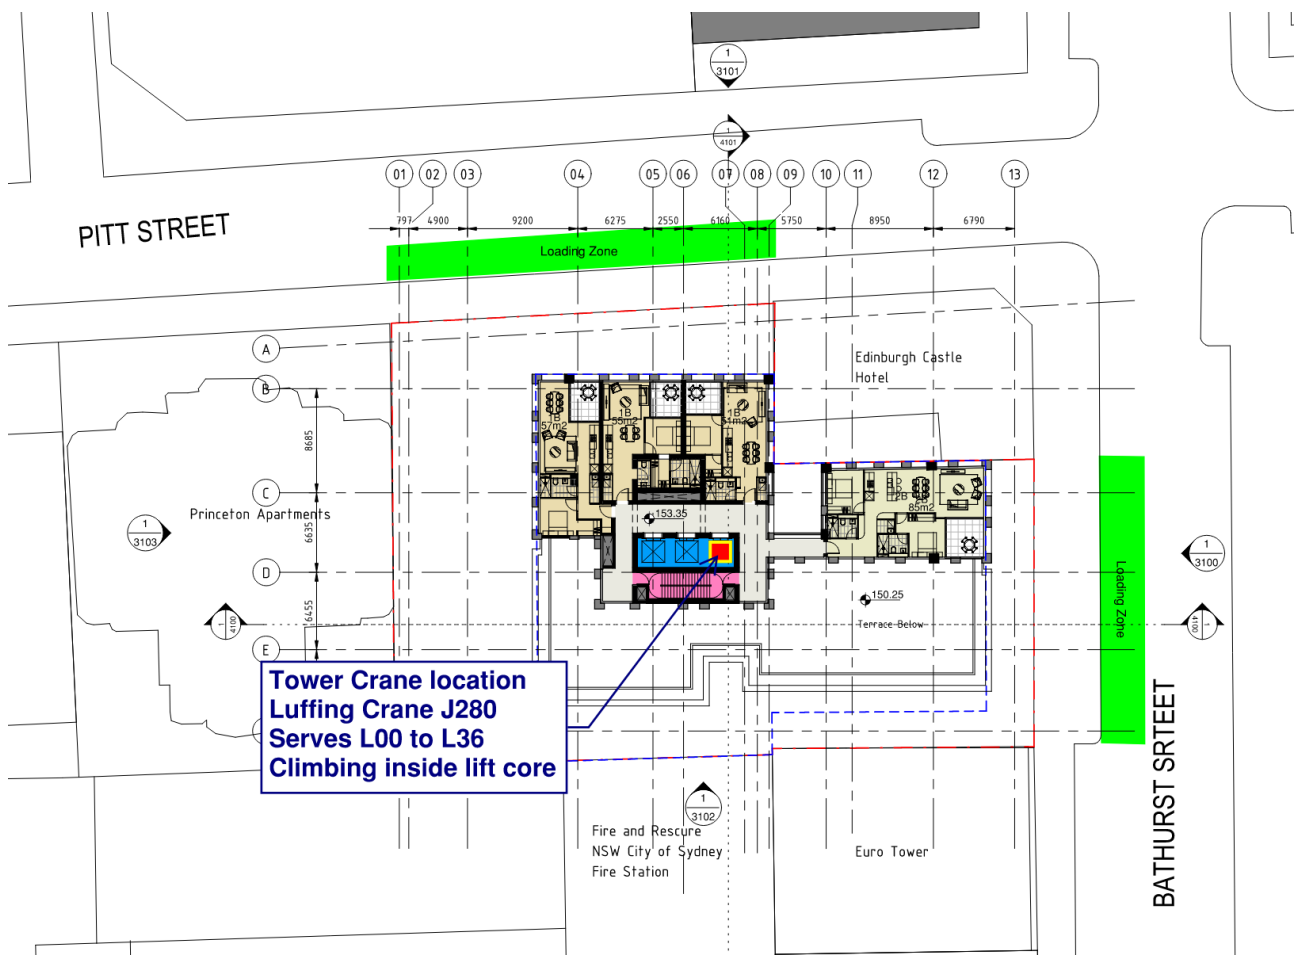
South Tower – Materials Handling – Tower Crane Recovery
